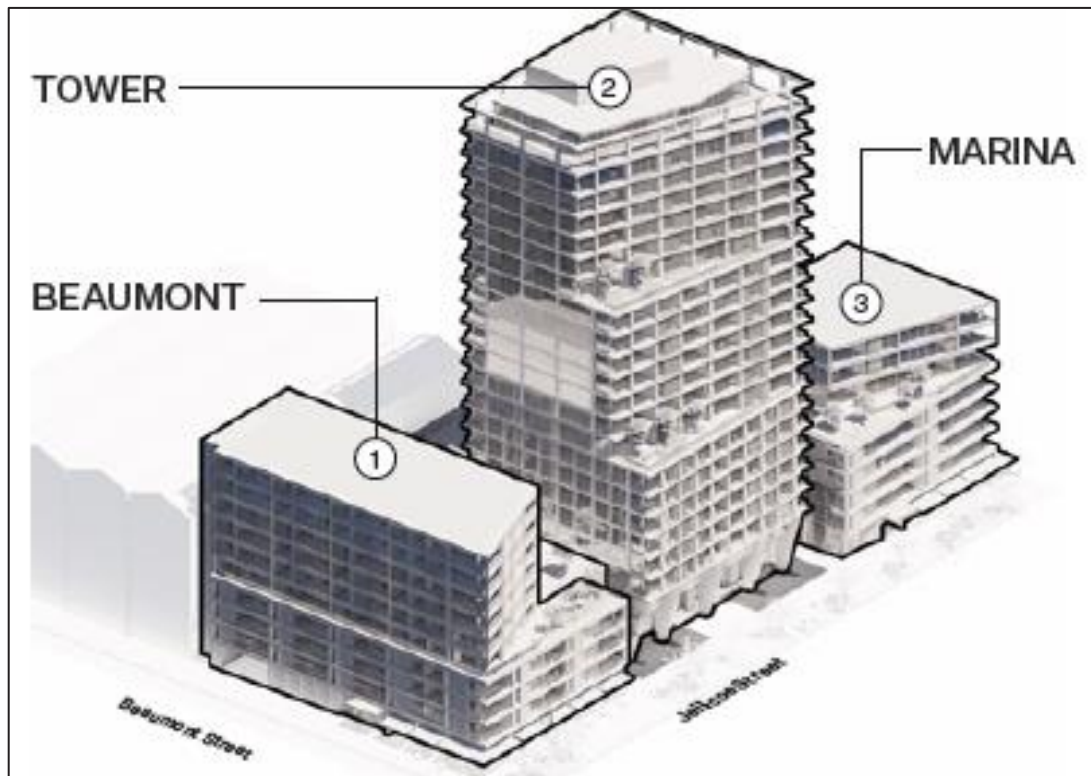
Concept design of project and three primary residential components of the building (Source: Warren and Mahoney Architects).
